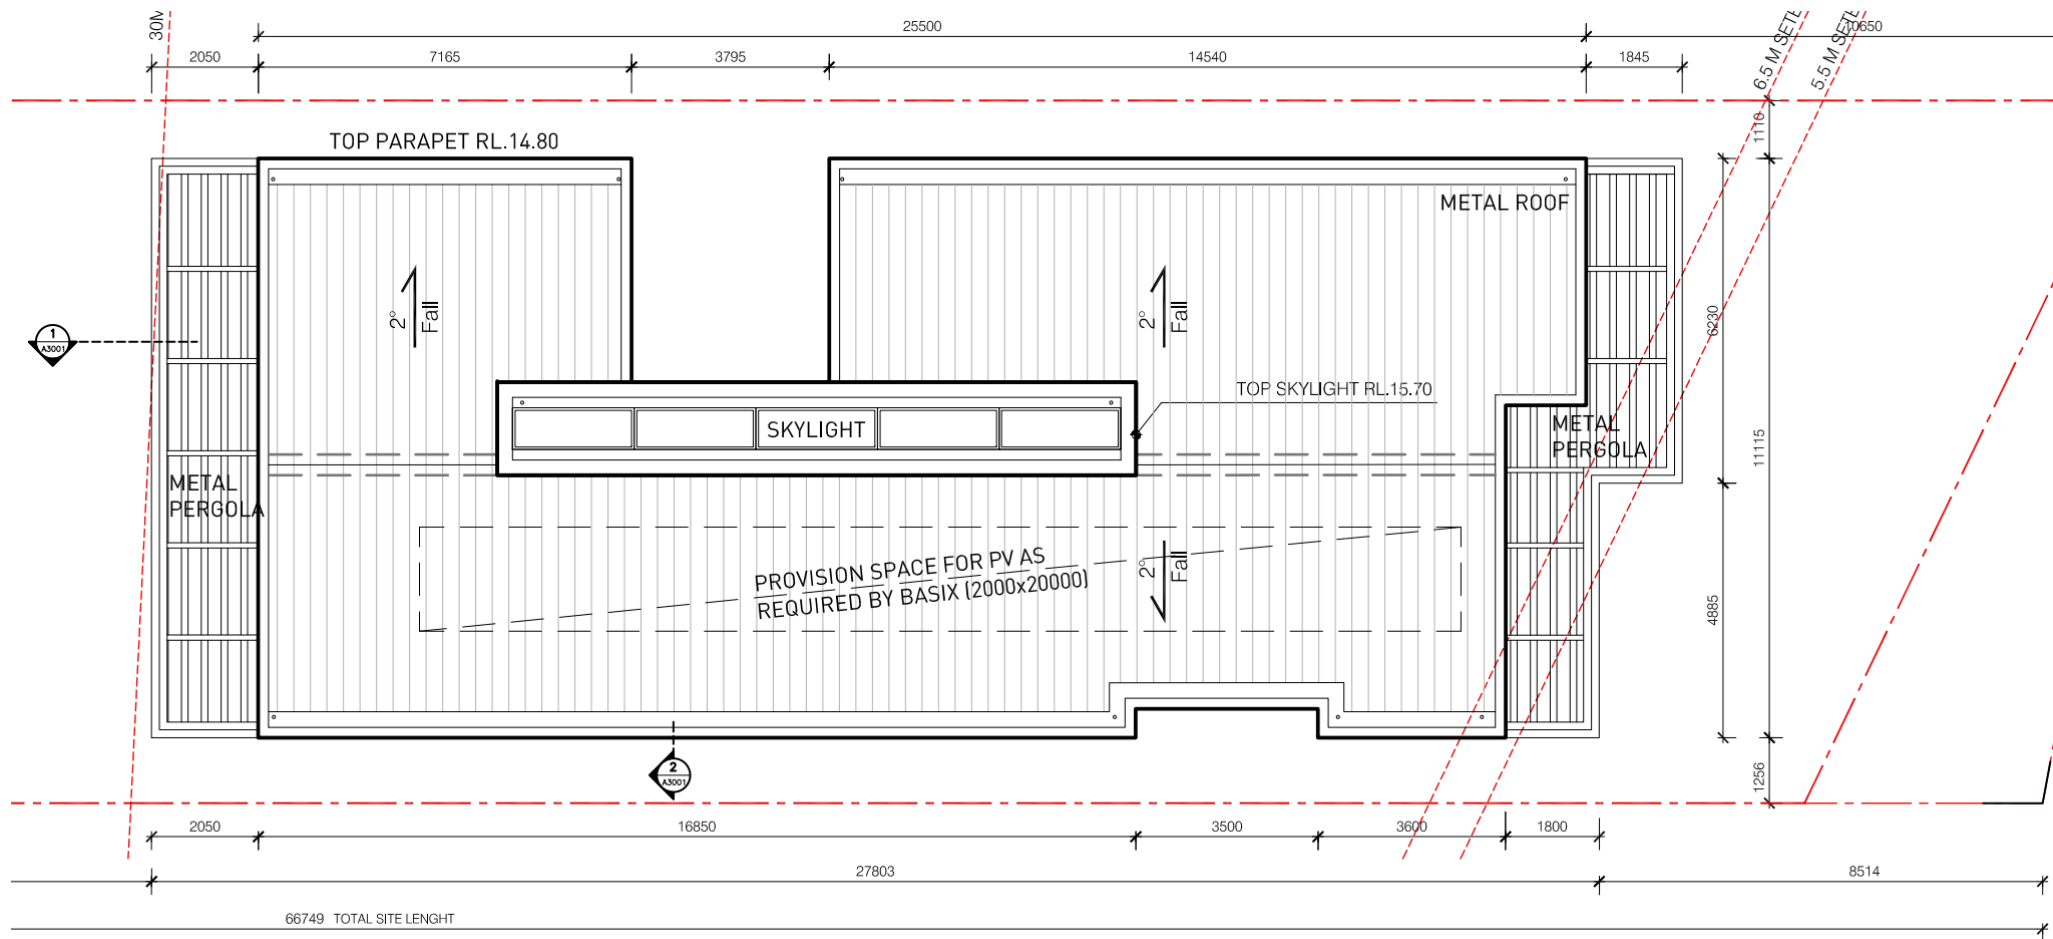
Roof Plan for DA-667/2017/A prepared by PTW Architects.
